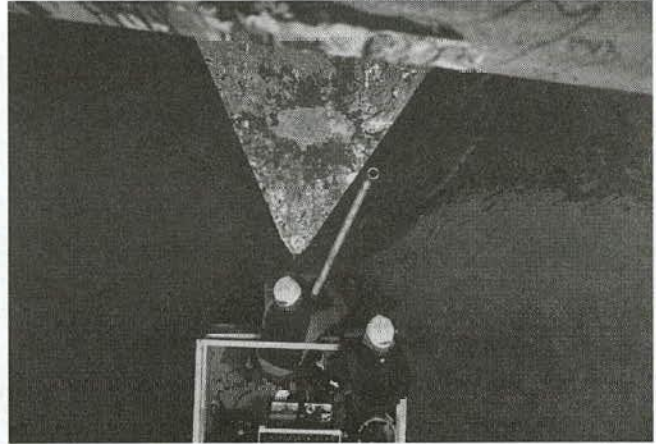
Installation at Minnesota bridge no. 9003 (MN3).
